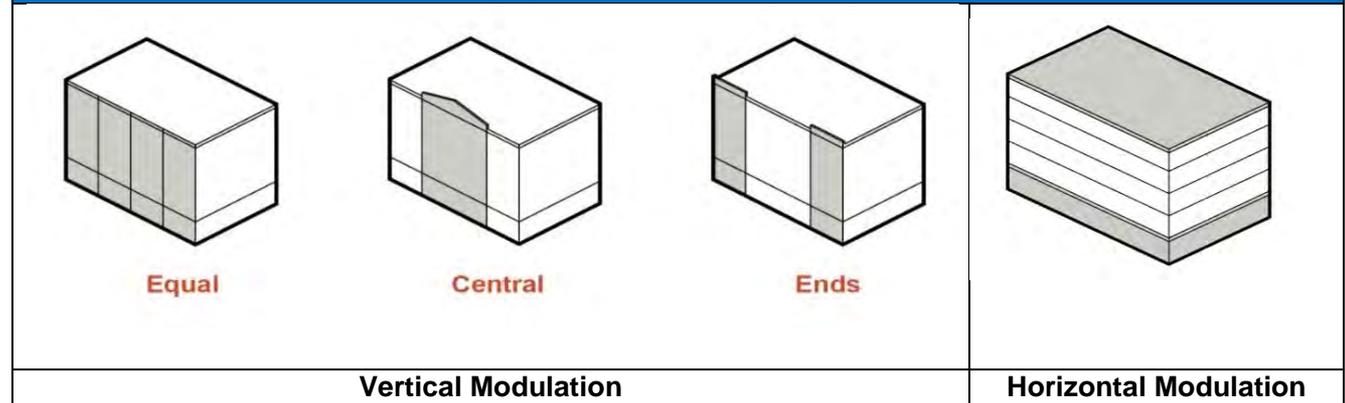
VERTICAL & HORIZONTAL STREET-FACING FACADE MODULATION
